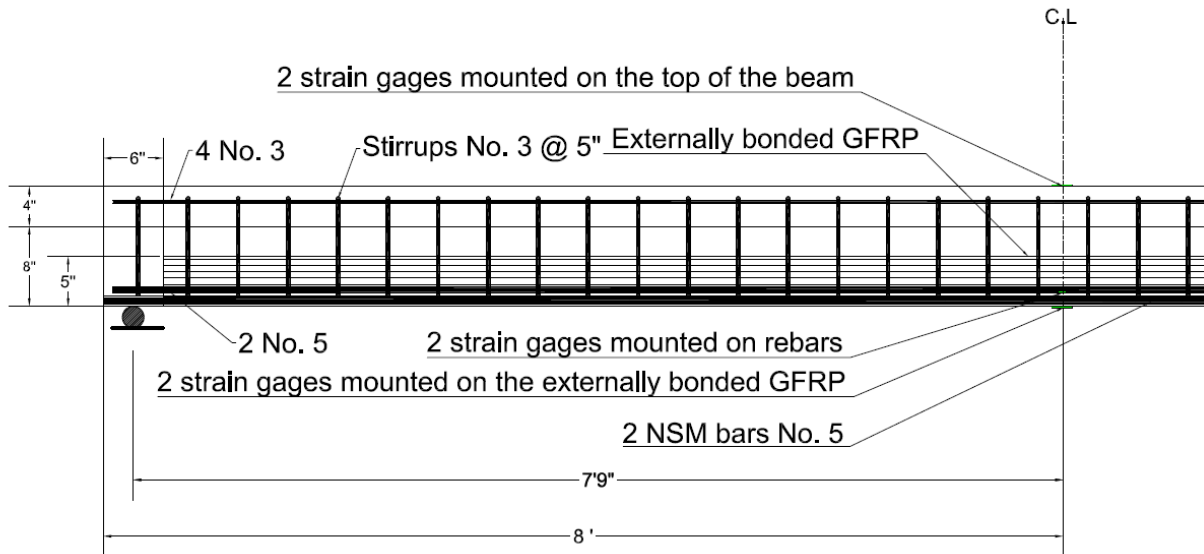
Reinforcement Details of the Control Beam T1.
